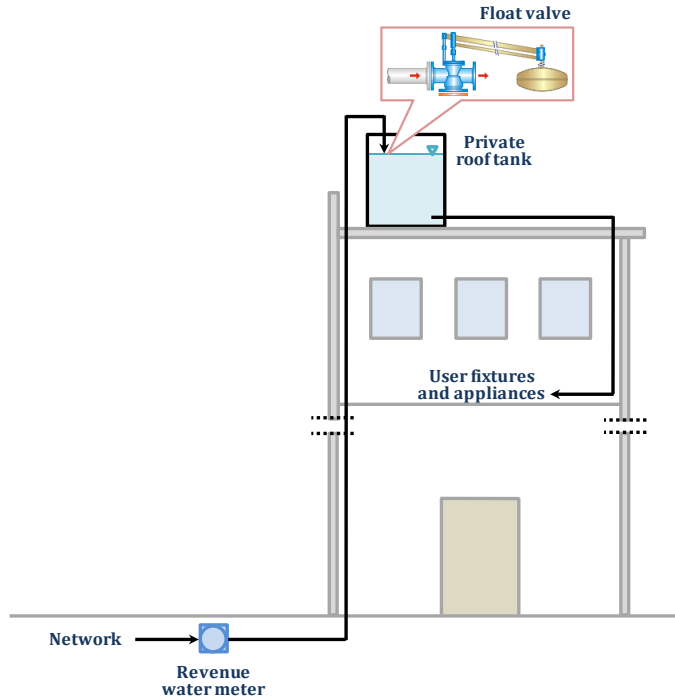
A schematic of a typical plumbing connection to a private roof tank (Criminisi et al. 2009)
